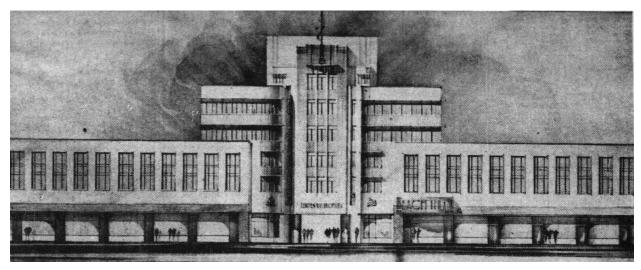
Rendering of Mercantile Bank Building, 420 Lincoln Road., Miami Beach, 1940. (Miami News, 5/12/1940, p. 30)
